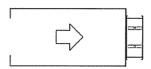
AMCA Figure 5.5 Damper Installed on a Plenum Wall
